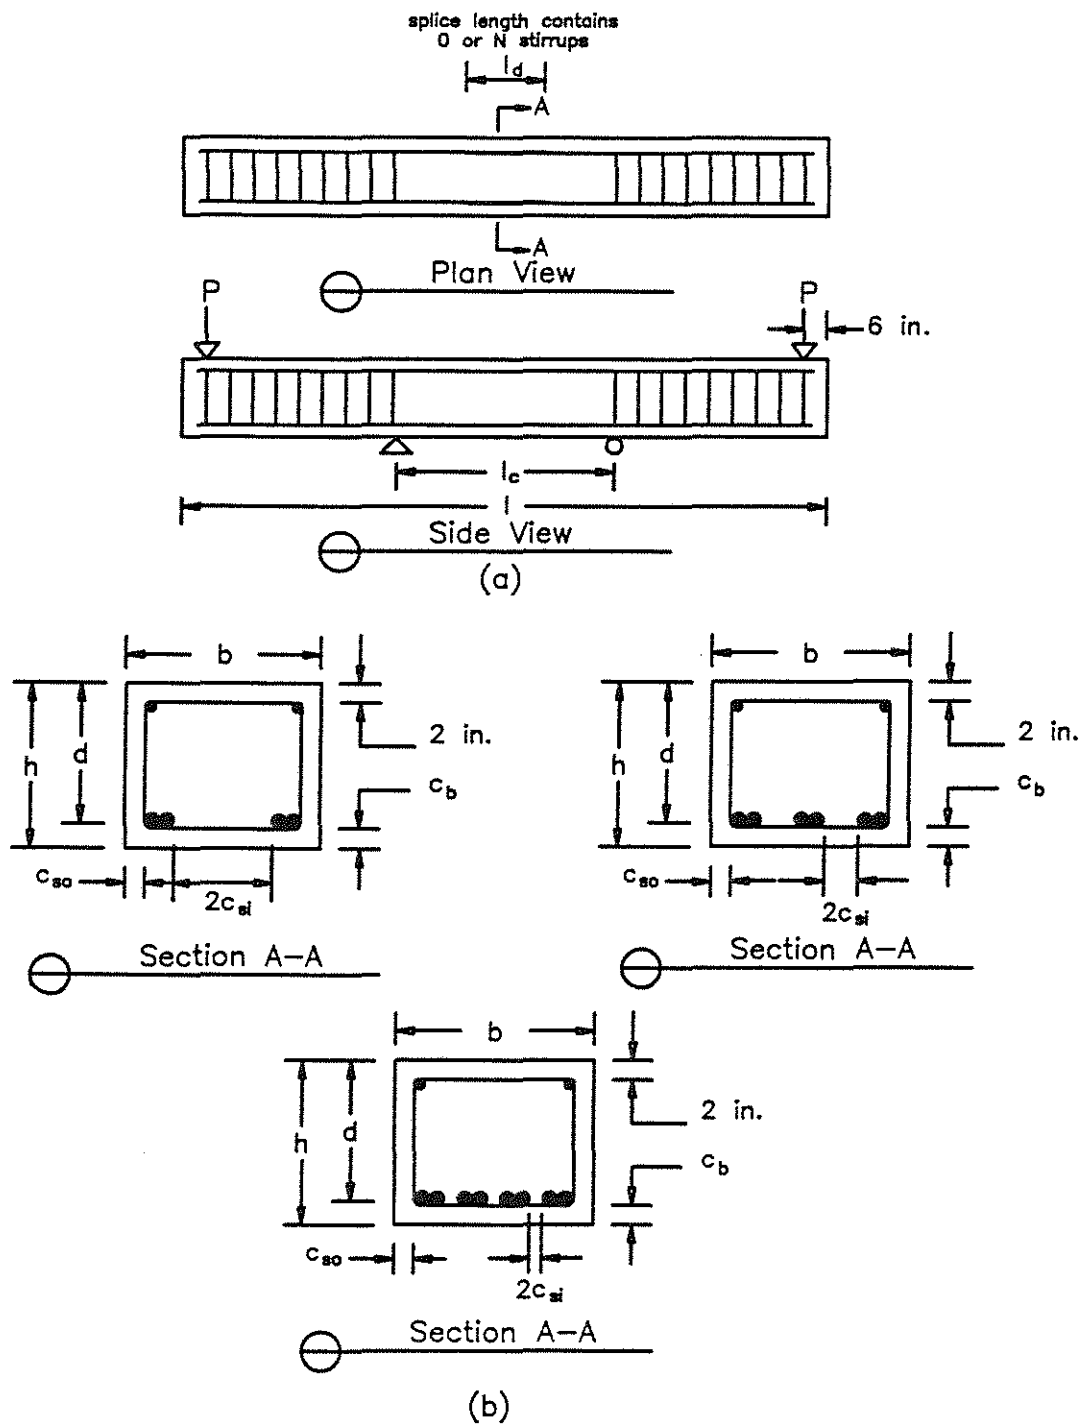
Splice test specimens, (a) as tested, (b) configurations as cast (1 in. = 25.4 mm)
